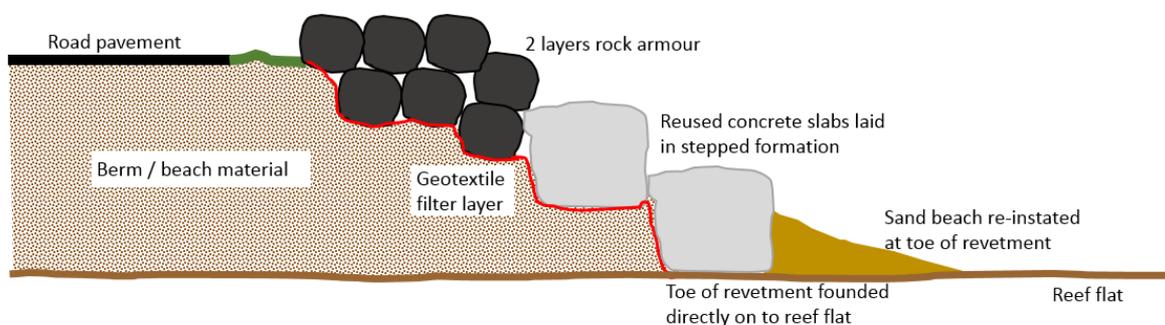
Cross-section of the proposed reconstructed revetment at Mosral. Source: Project Proposal Document
